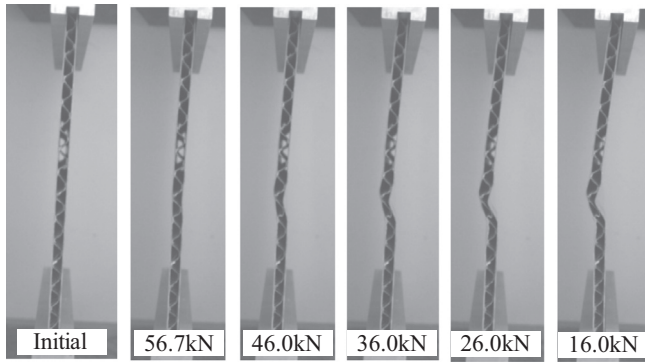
Failure process of perfect truss core sandwich panel.
